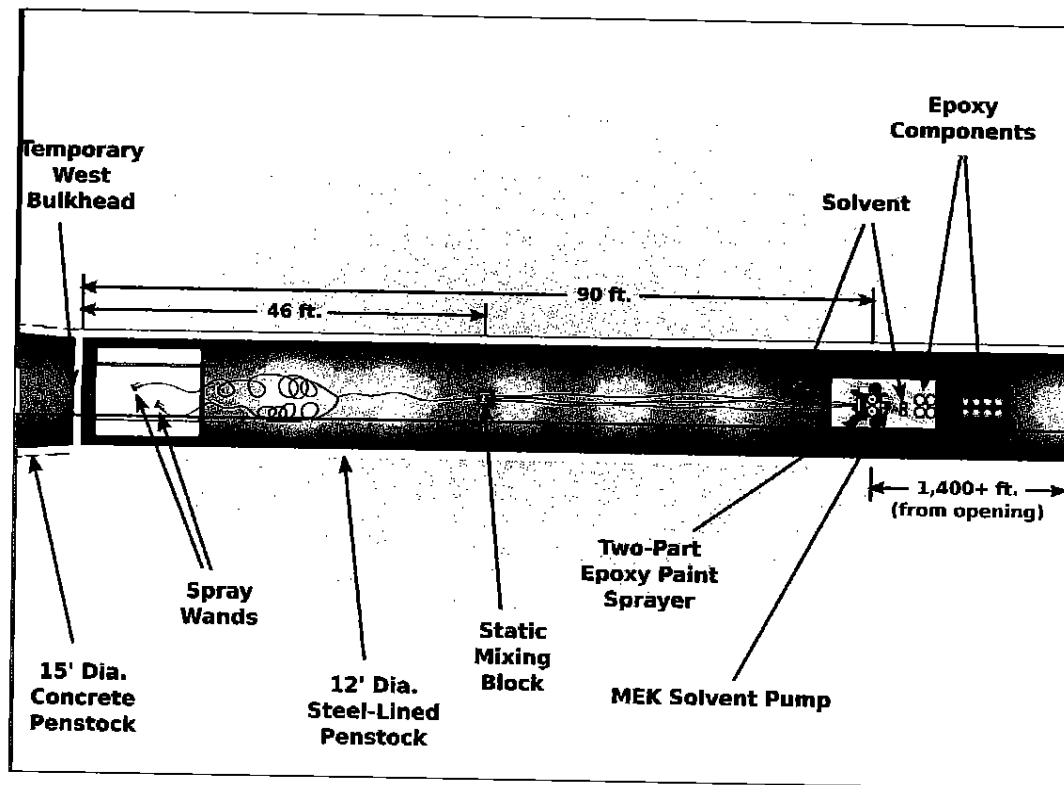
Aerial view of equipment arrangement in work area of the penstock
